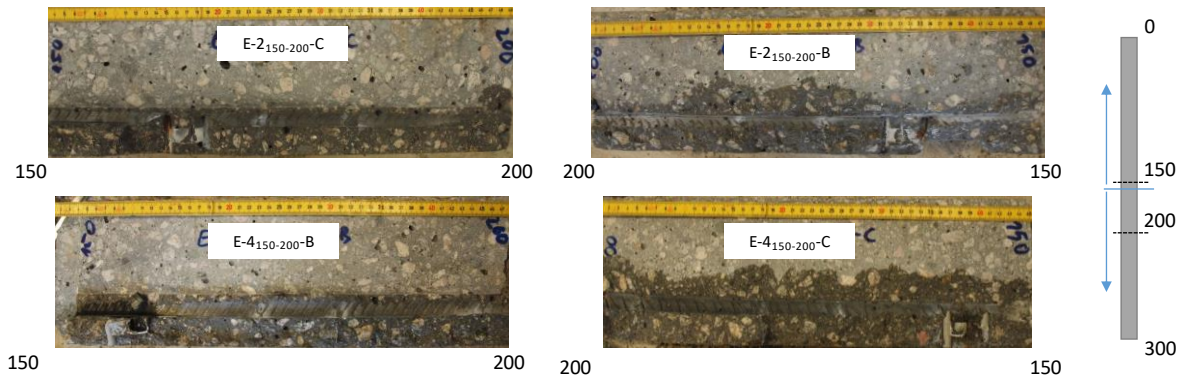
Steel-concrete interface of beam E section 150 to 200 cm. White precipitate at the cracks and spread over the steel-concrete interface. Localized corrosion at the spacer
